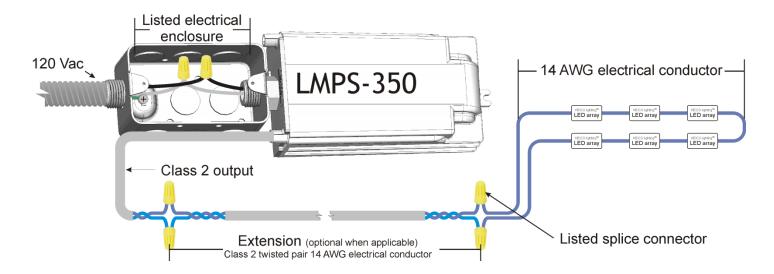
Electrical connections for installation in dry and damp locations (twisted pair extension and LMPS-350 shown, others are similar)
